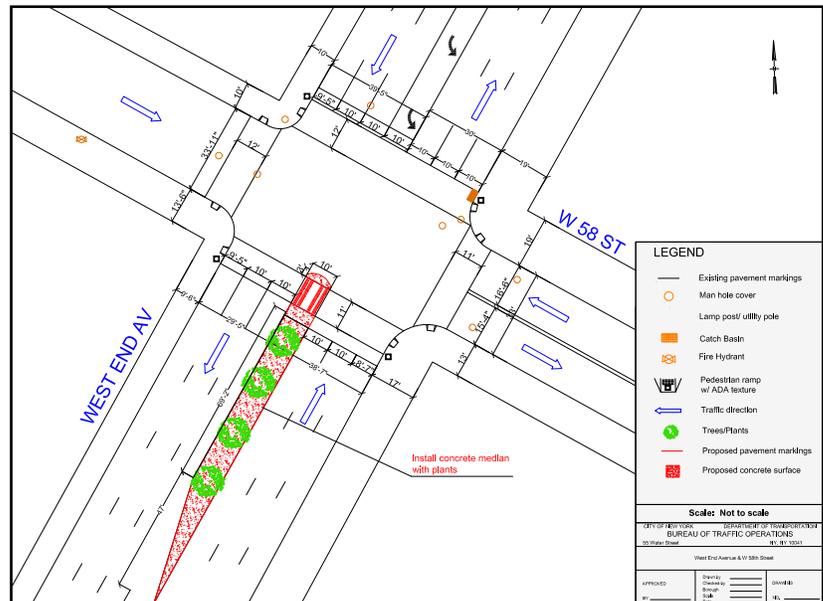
Proposed Condition - West End Avenue & West 58th Street
